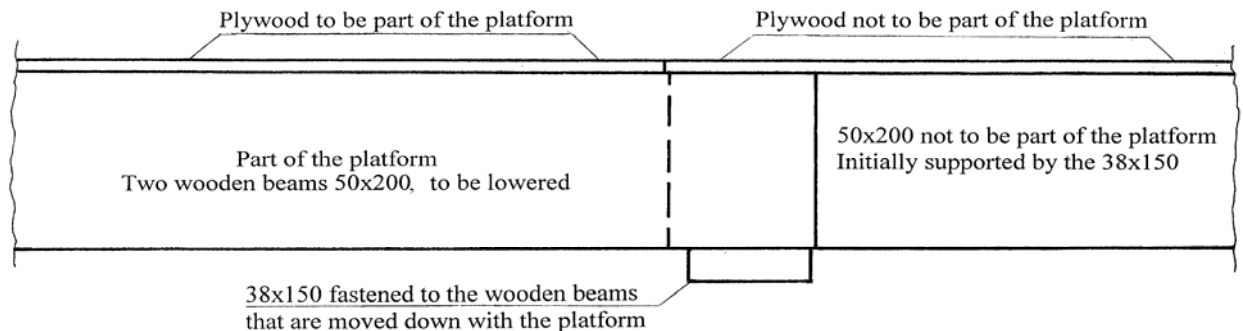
Joint in wooden beam that lets the platform for removing the temporary chord be lowered
